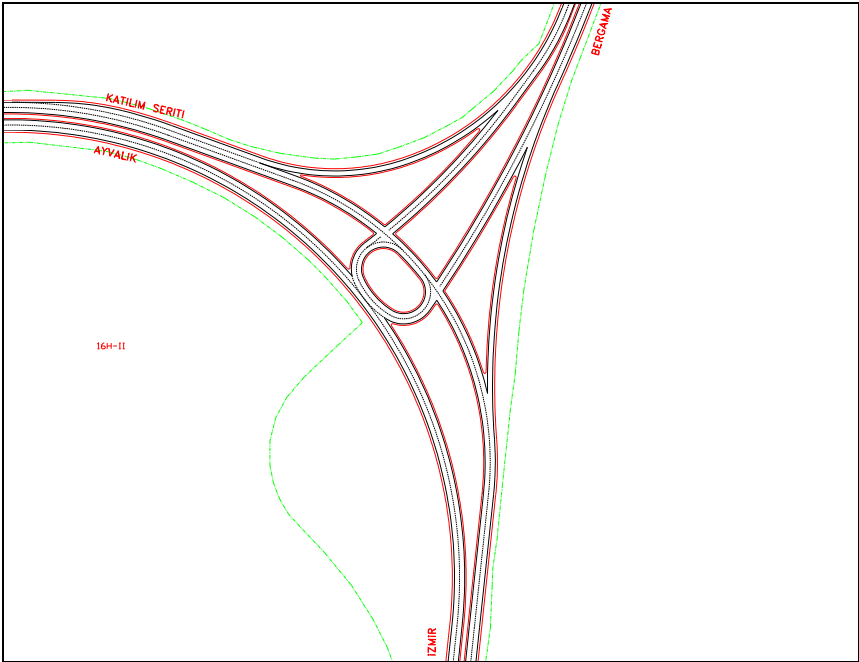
Proposed solution, three lanes weaving section, one lane on bypass (alternative 2)
